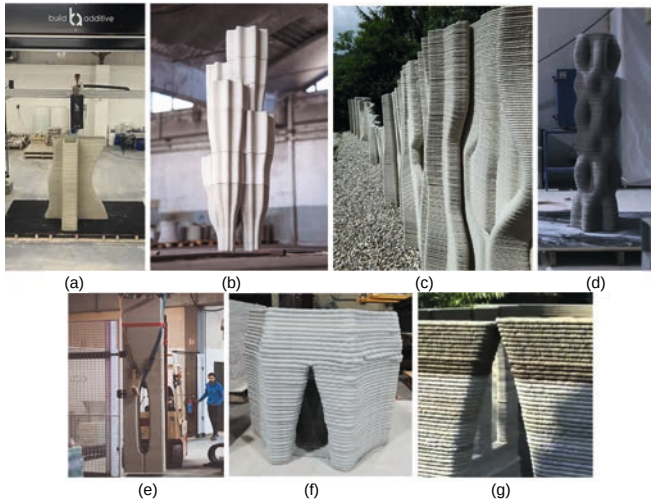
Fabricated examples of E-3DCP parts featuring overhangs: a) Part 3D printed using Build Additive [20] heating nozzle, b) Part 3D printed using Vertico [21,26] 2K system, c) Part 3D printed using Baunit's Bauminator [22,27] 2K system, d) Part 3D printed using X-tree [23,28] 2K system, e) An example of the work presented by Alabbasi et al. [24] using overhangs as a method to create openings, f) An example of the work presented by Duarte et al. [25] using overhangs as a method to create openings, g) An example of the work presented by Tay et al. [14] using overhangs as a method to create openings.
